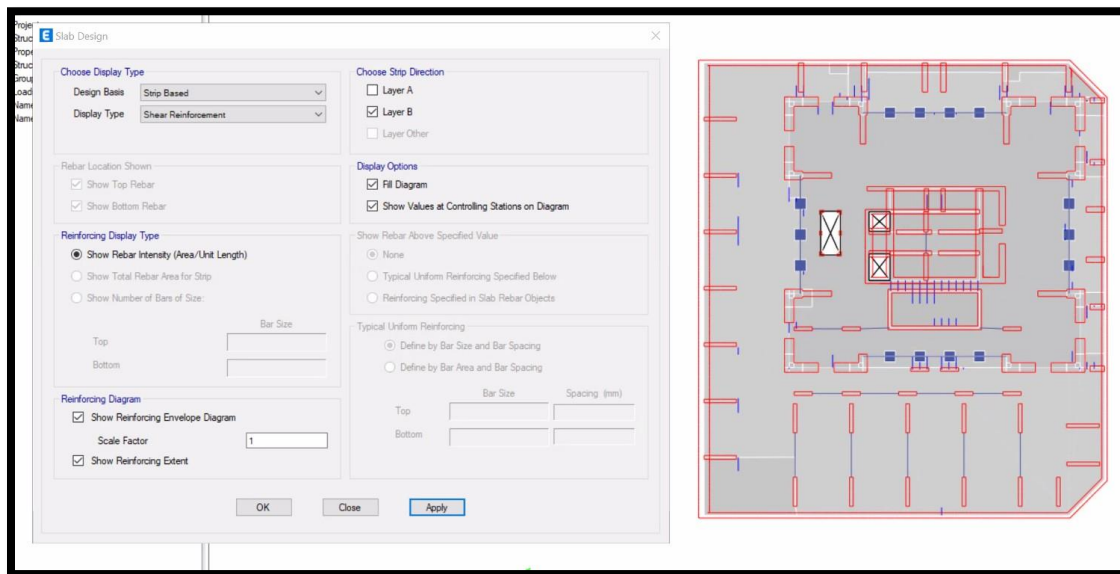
Shear Reinforcement in Y-Direction for 4th Basement Floor
